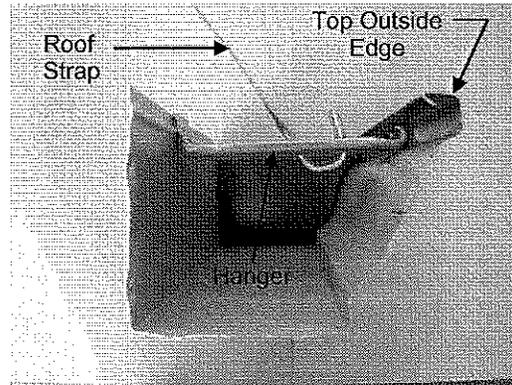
Typical Gutter Hanger and Roof Strap Attachment
